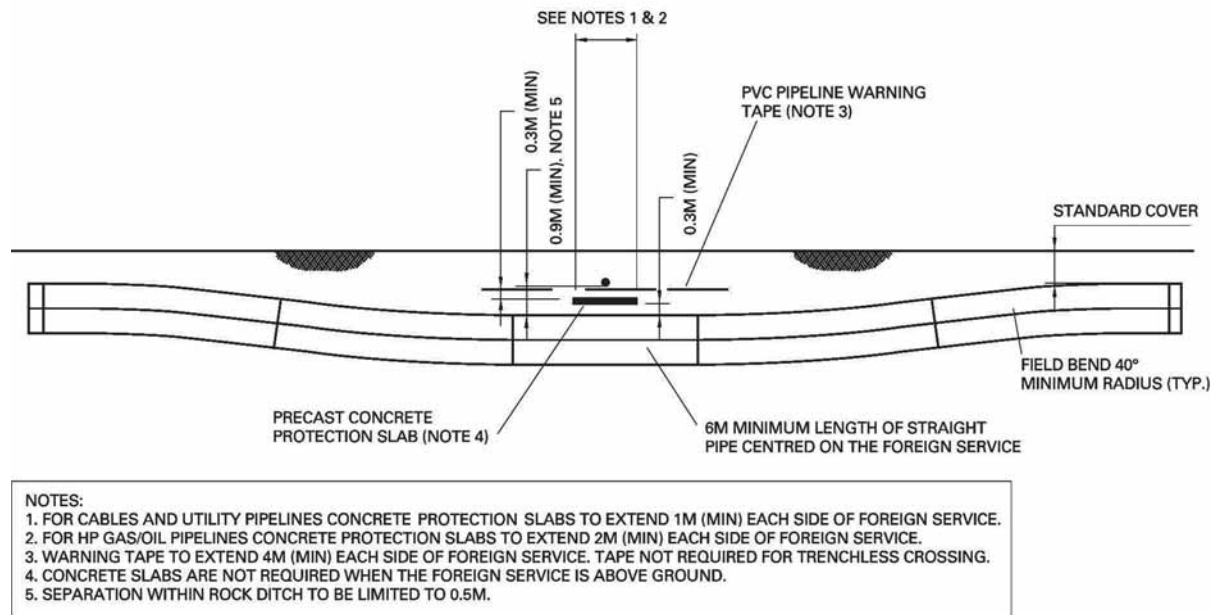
Preliminary Typical Trenchless Service Crossing
